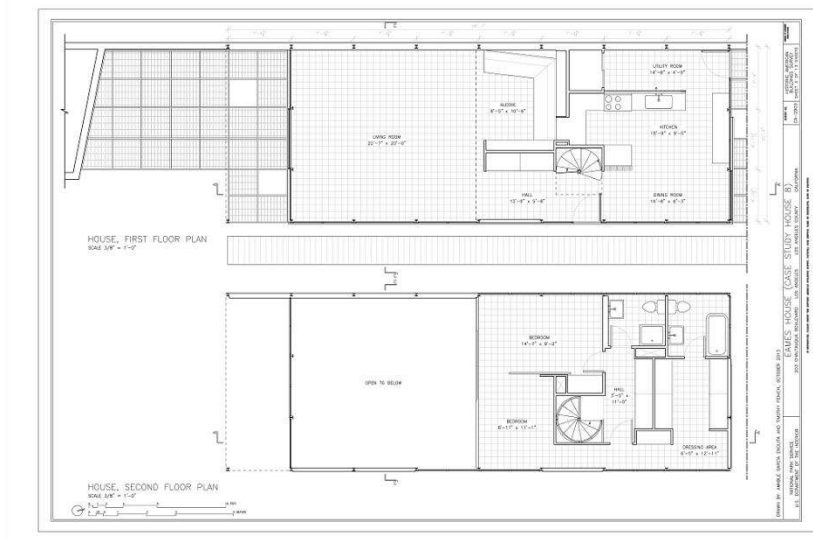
Eames House First Floor Plan (Library of Congress 2015).
